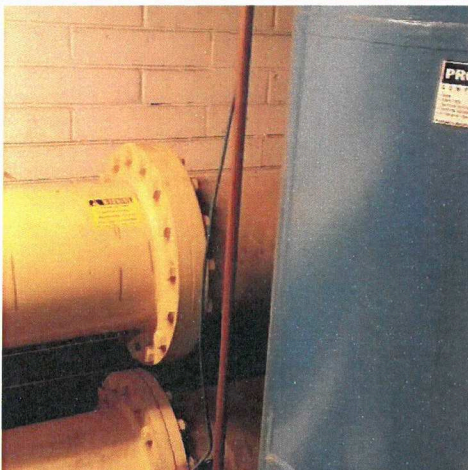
Level 23, Plant Room, Hot Water Pump 2 - Gasket
